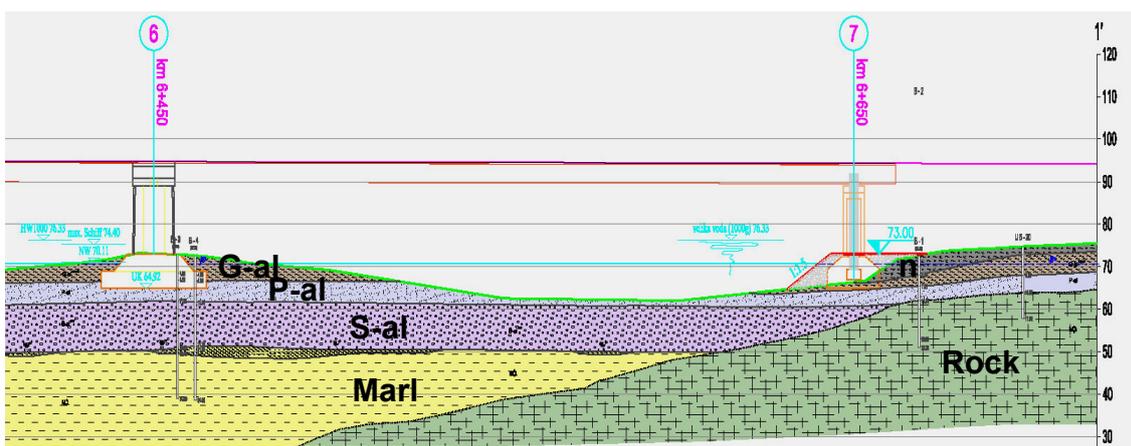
Geological longitudinal section at piers 6 and 7 (not scaled). [15]
